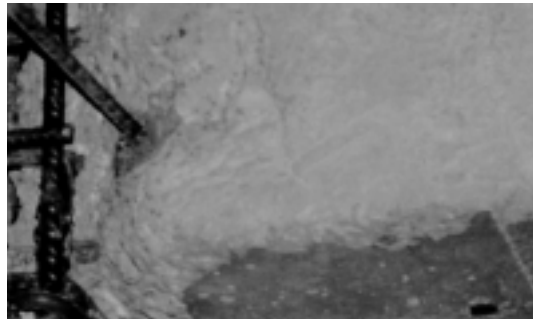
Additional joint ties were inserted through the holes and cemented with epoxy adhesive gel
